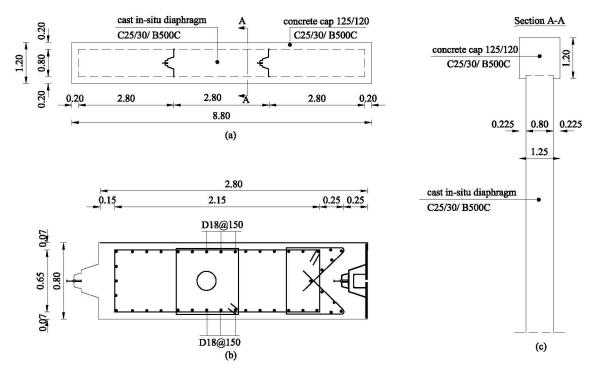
(a) Plan view of the barrette wall (b) reinforcement detailing and (c) Section A-A
